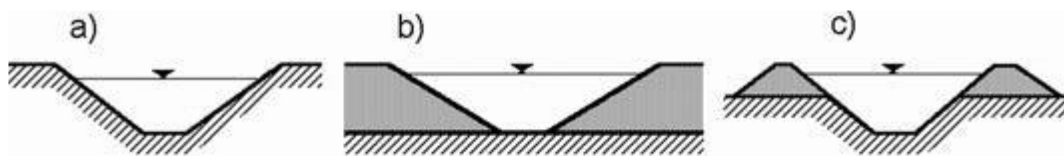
Channels are one kind of water conveying structures – (a) Excavation into the ground, (b) formed by embankments, (c) both of a and b. Course beds which are made of reinforced concrete, wood, metal or ground.
